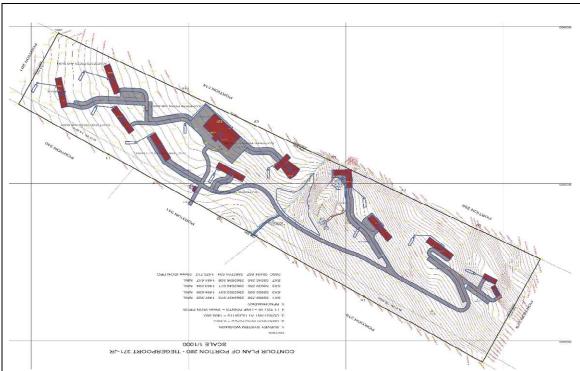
Shows alternative road and building layouts to reduce the impact on the land
